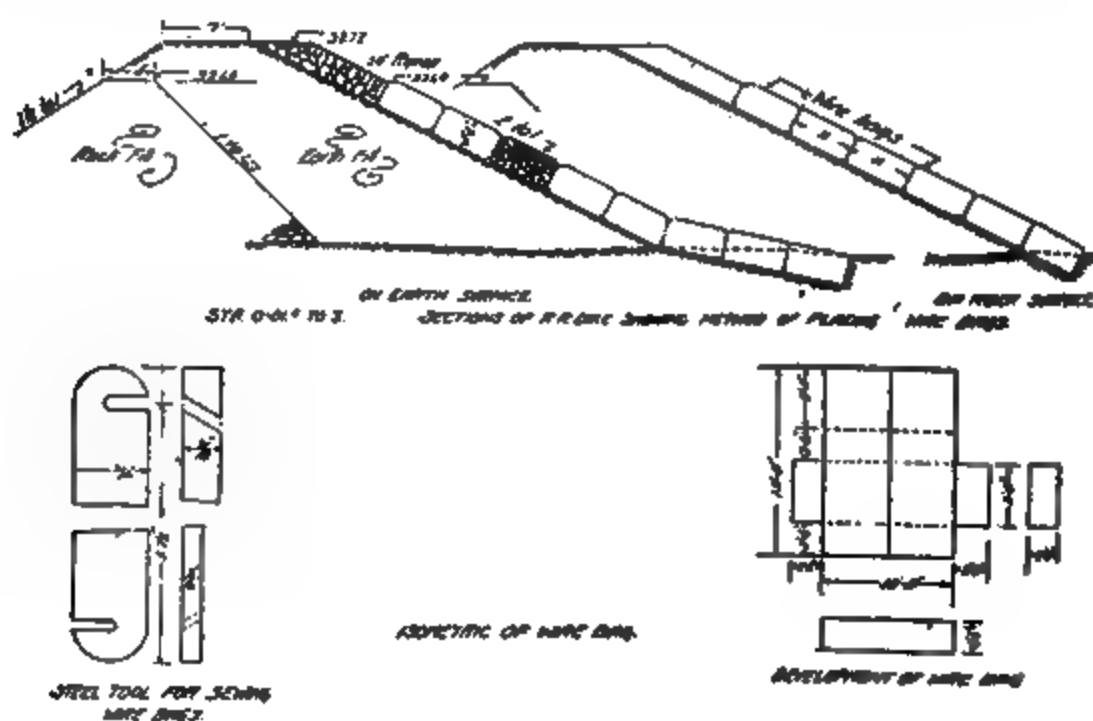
Sections of dike showing method of placing wire bags, and details of wire bag and tool for its manufacture.
